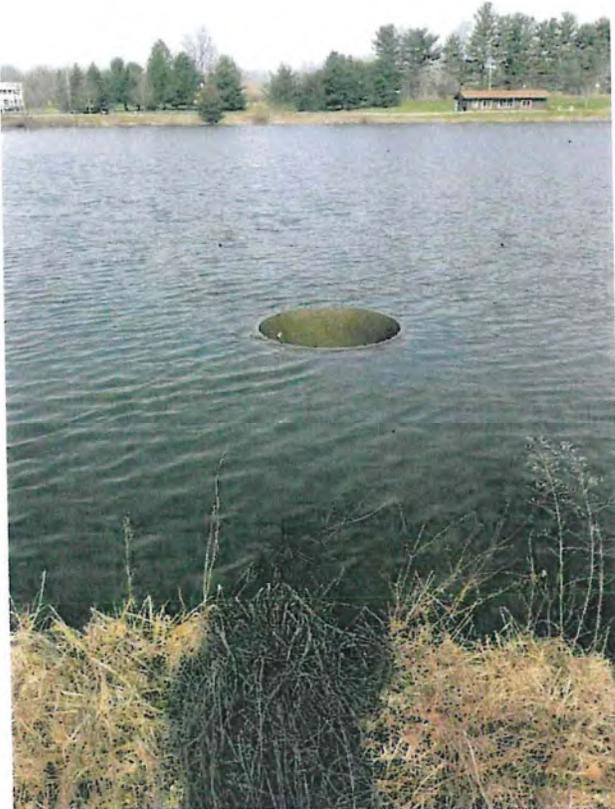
Lake Paterek outlet structure (photo facing northwest). Photo source: Chagrin River Watershed Partners, April 11, 2018.
